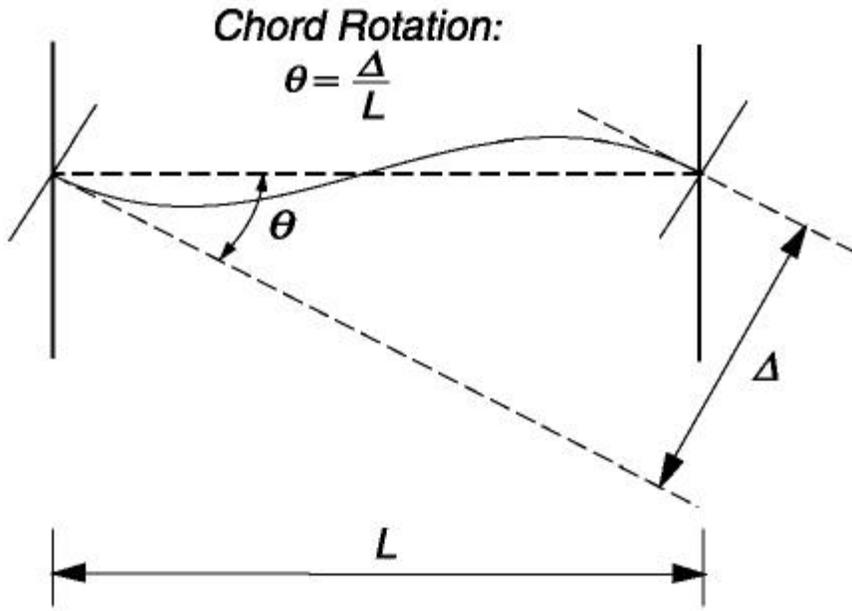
Chord Rotation for Shear Wall Coupling Beams
